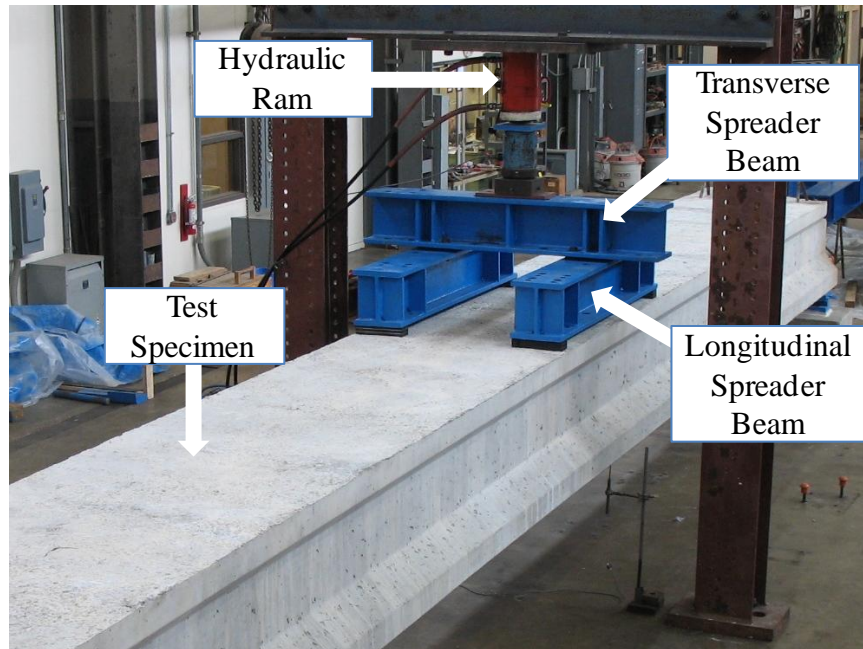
Spreader beam loading system used by Schnittker (2008)
